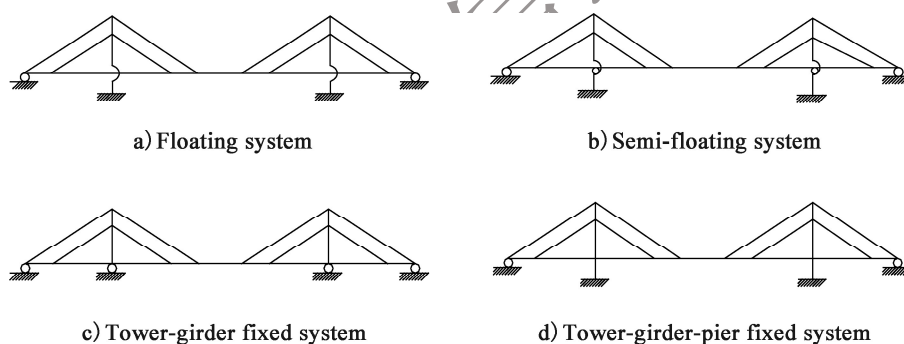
Four basic structural systems of cable-stayed bridges
